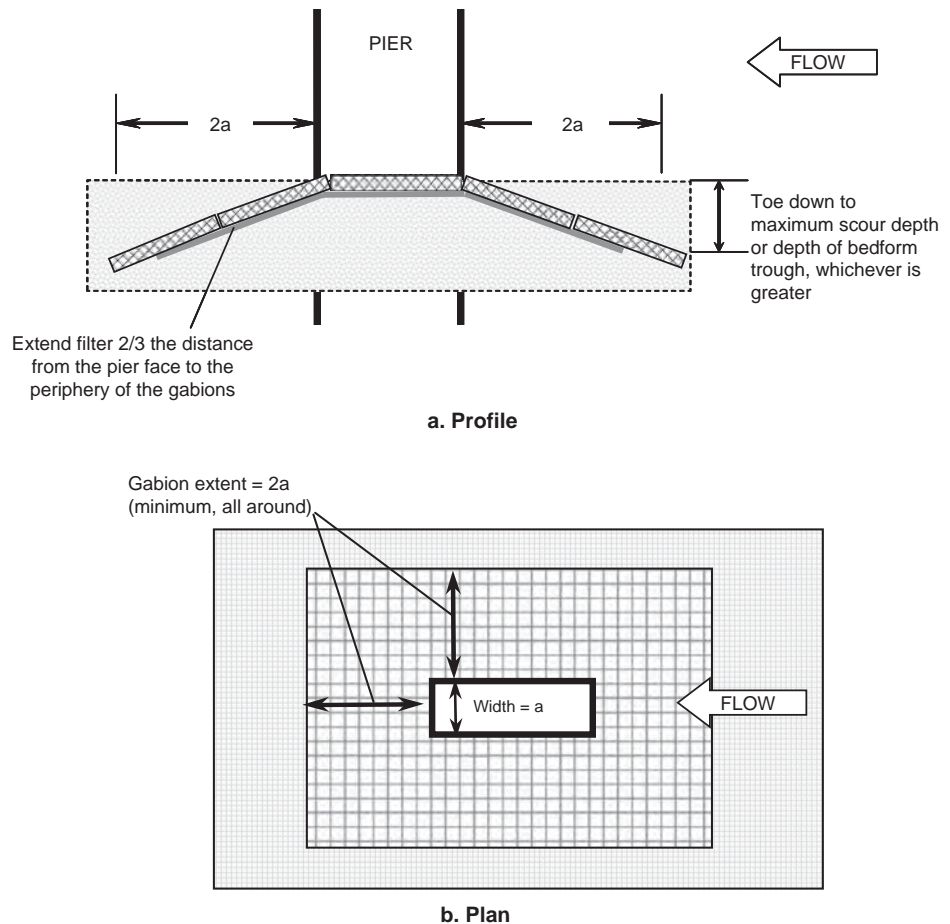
Gabion mattress layout diagram for pier scour countermeasures.
